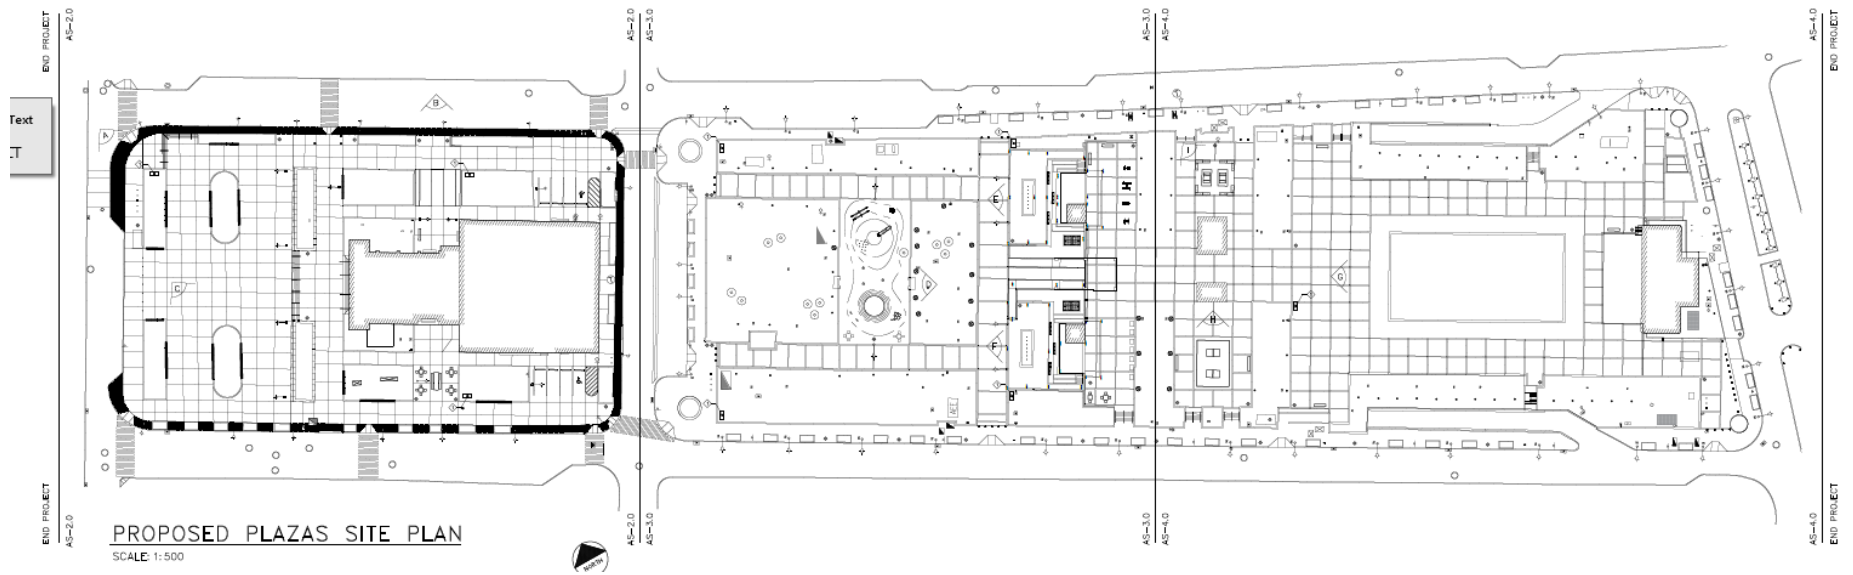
Plaza del Pilar. Proposed plaza site plan. (Source: Drawing AS-2.0, Hernández-Bauzá PSC Architects, 2024)
